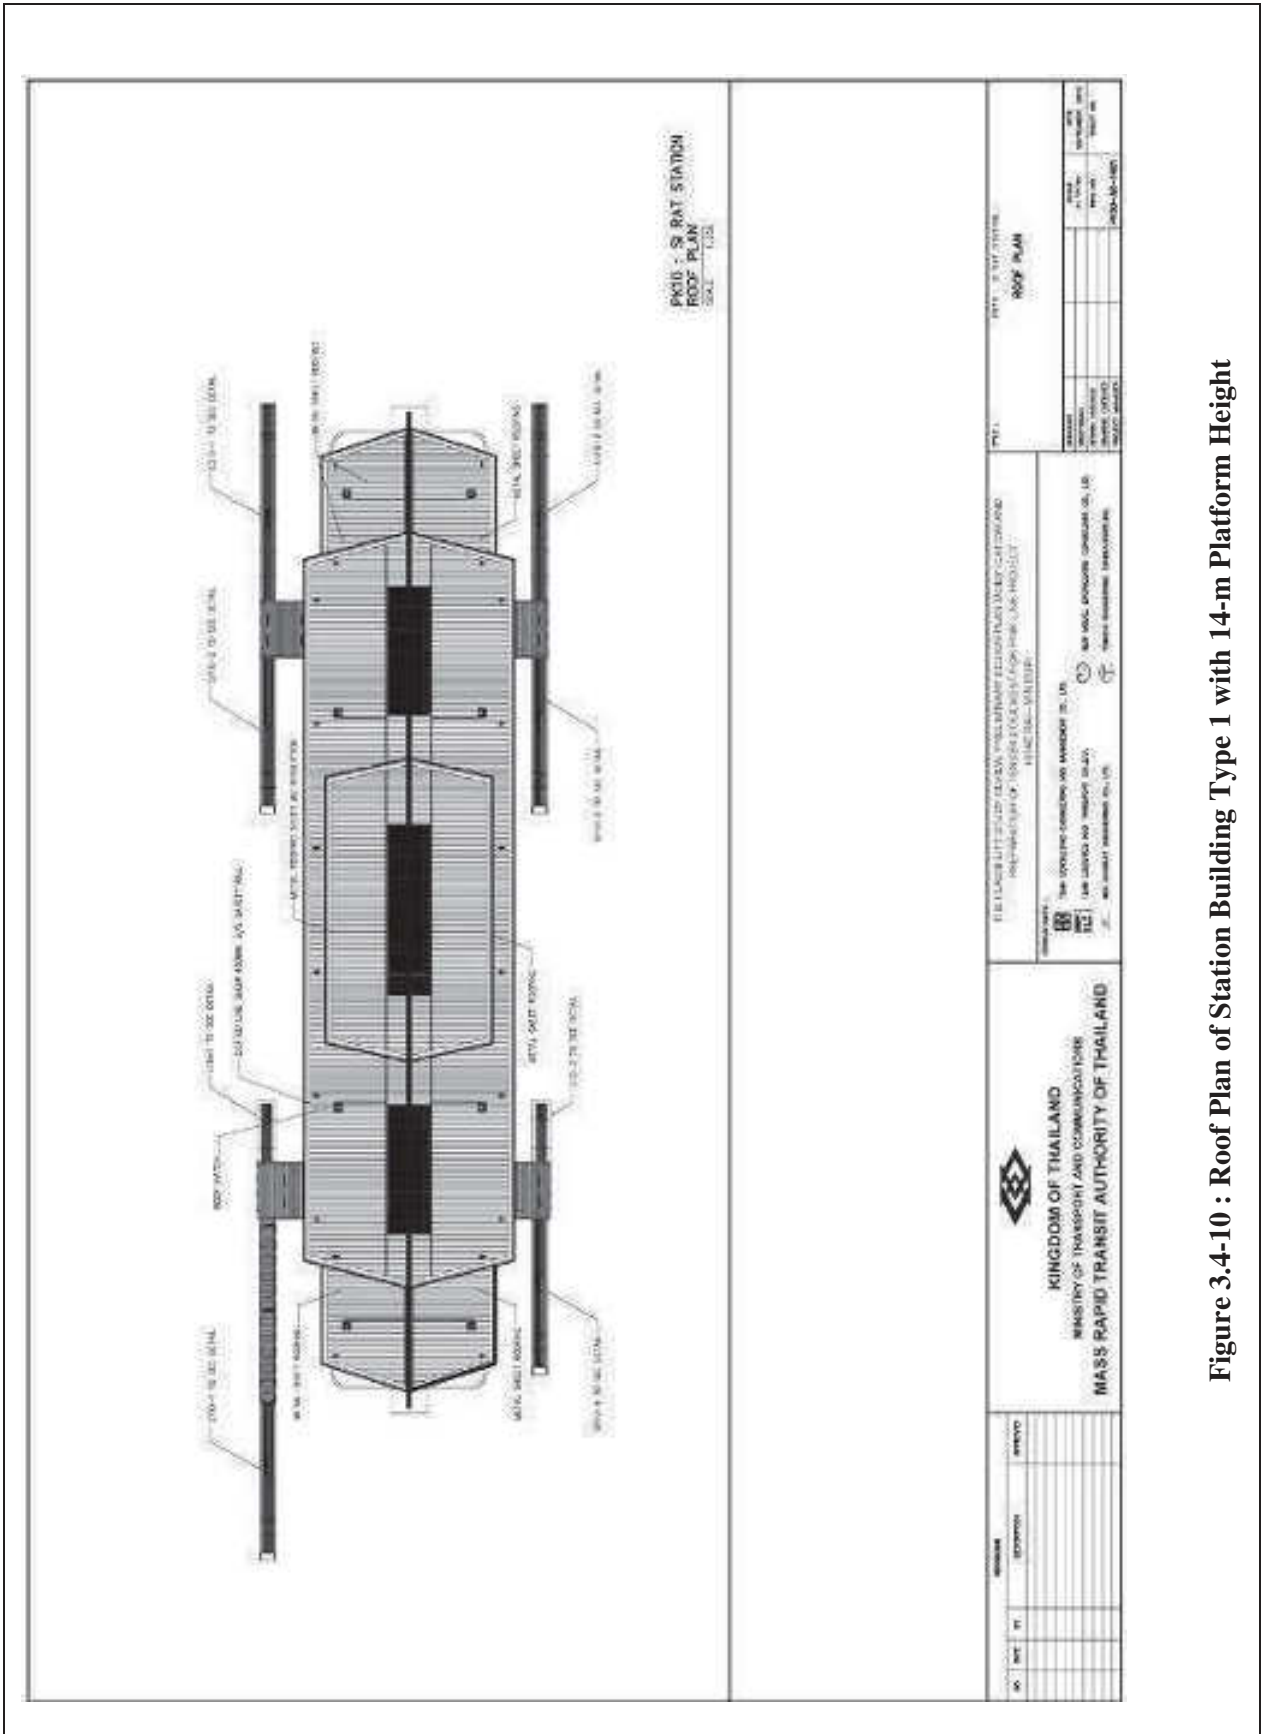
Roof Plan of Station Building Type 1 with 14-m Platform Height
